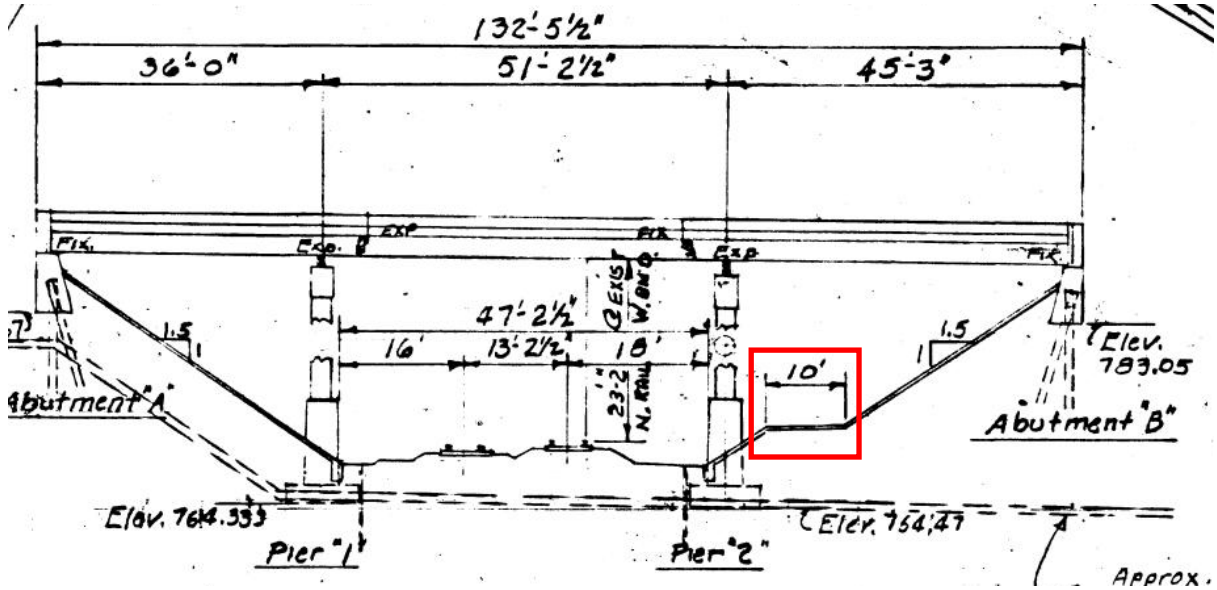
East Medical Center Drive over Railroad (1982 plans)
